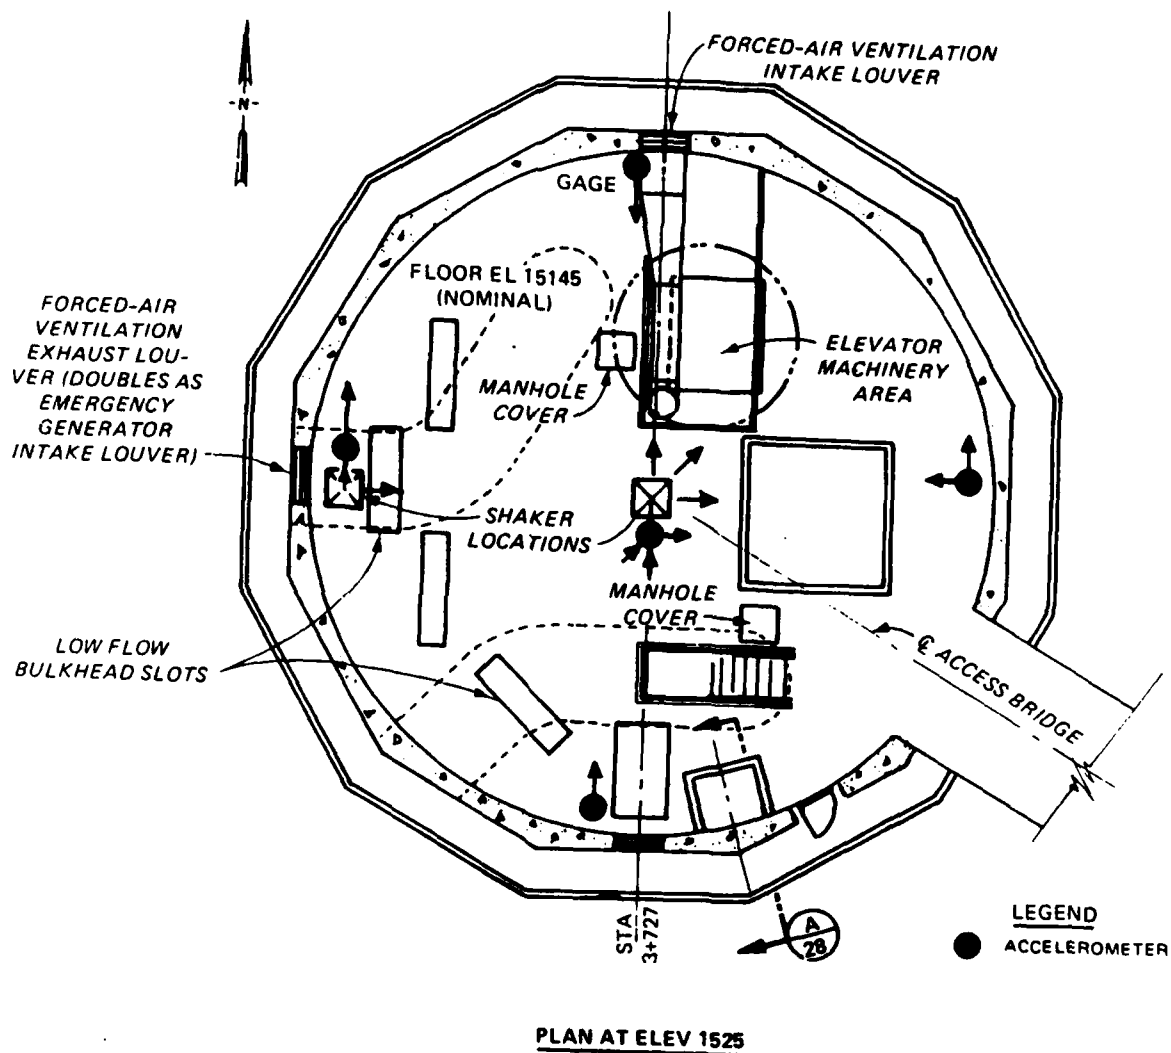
Accelerometer and shaker locations at elevation 1,515.0 ft
